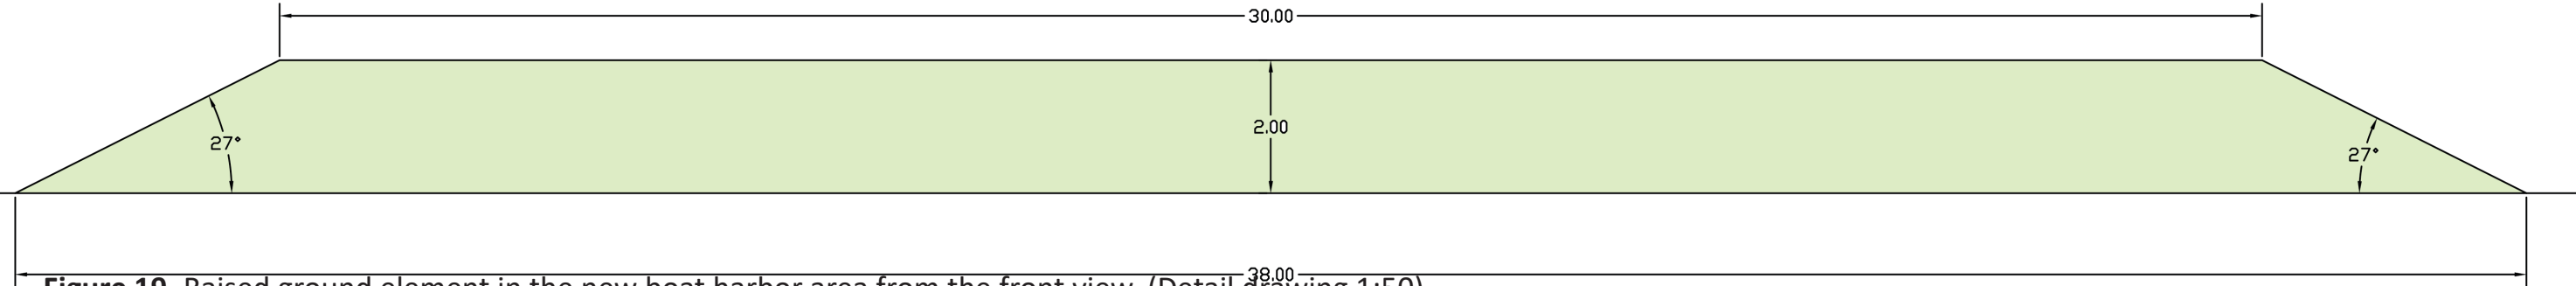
Raised ground element in the new boat harbor area from the front view. (Detail drawing 1:50)
